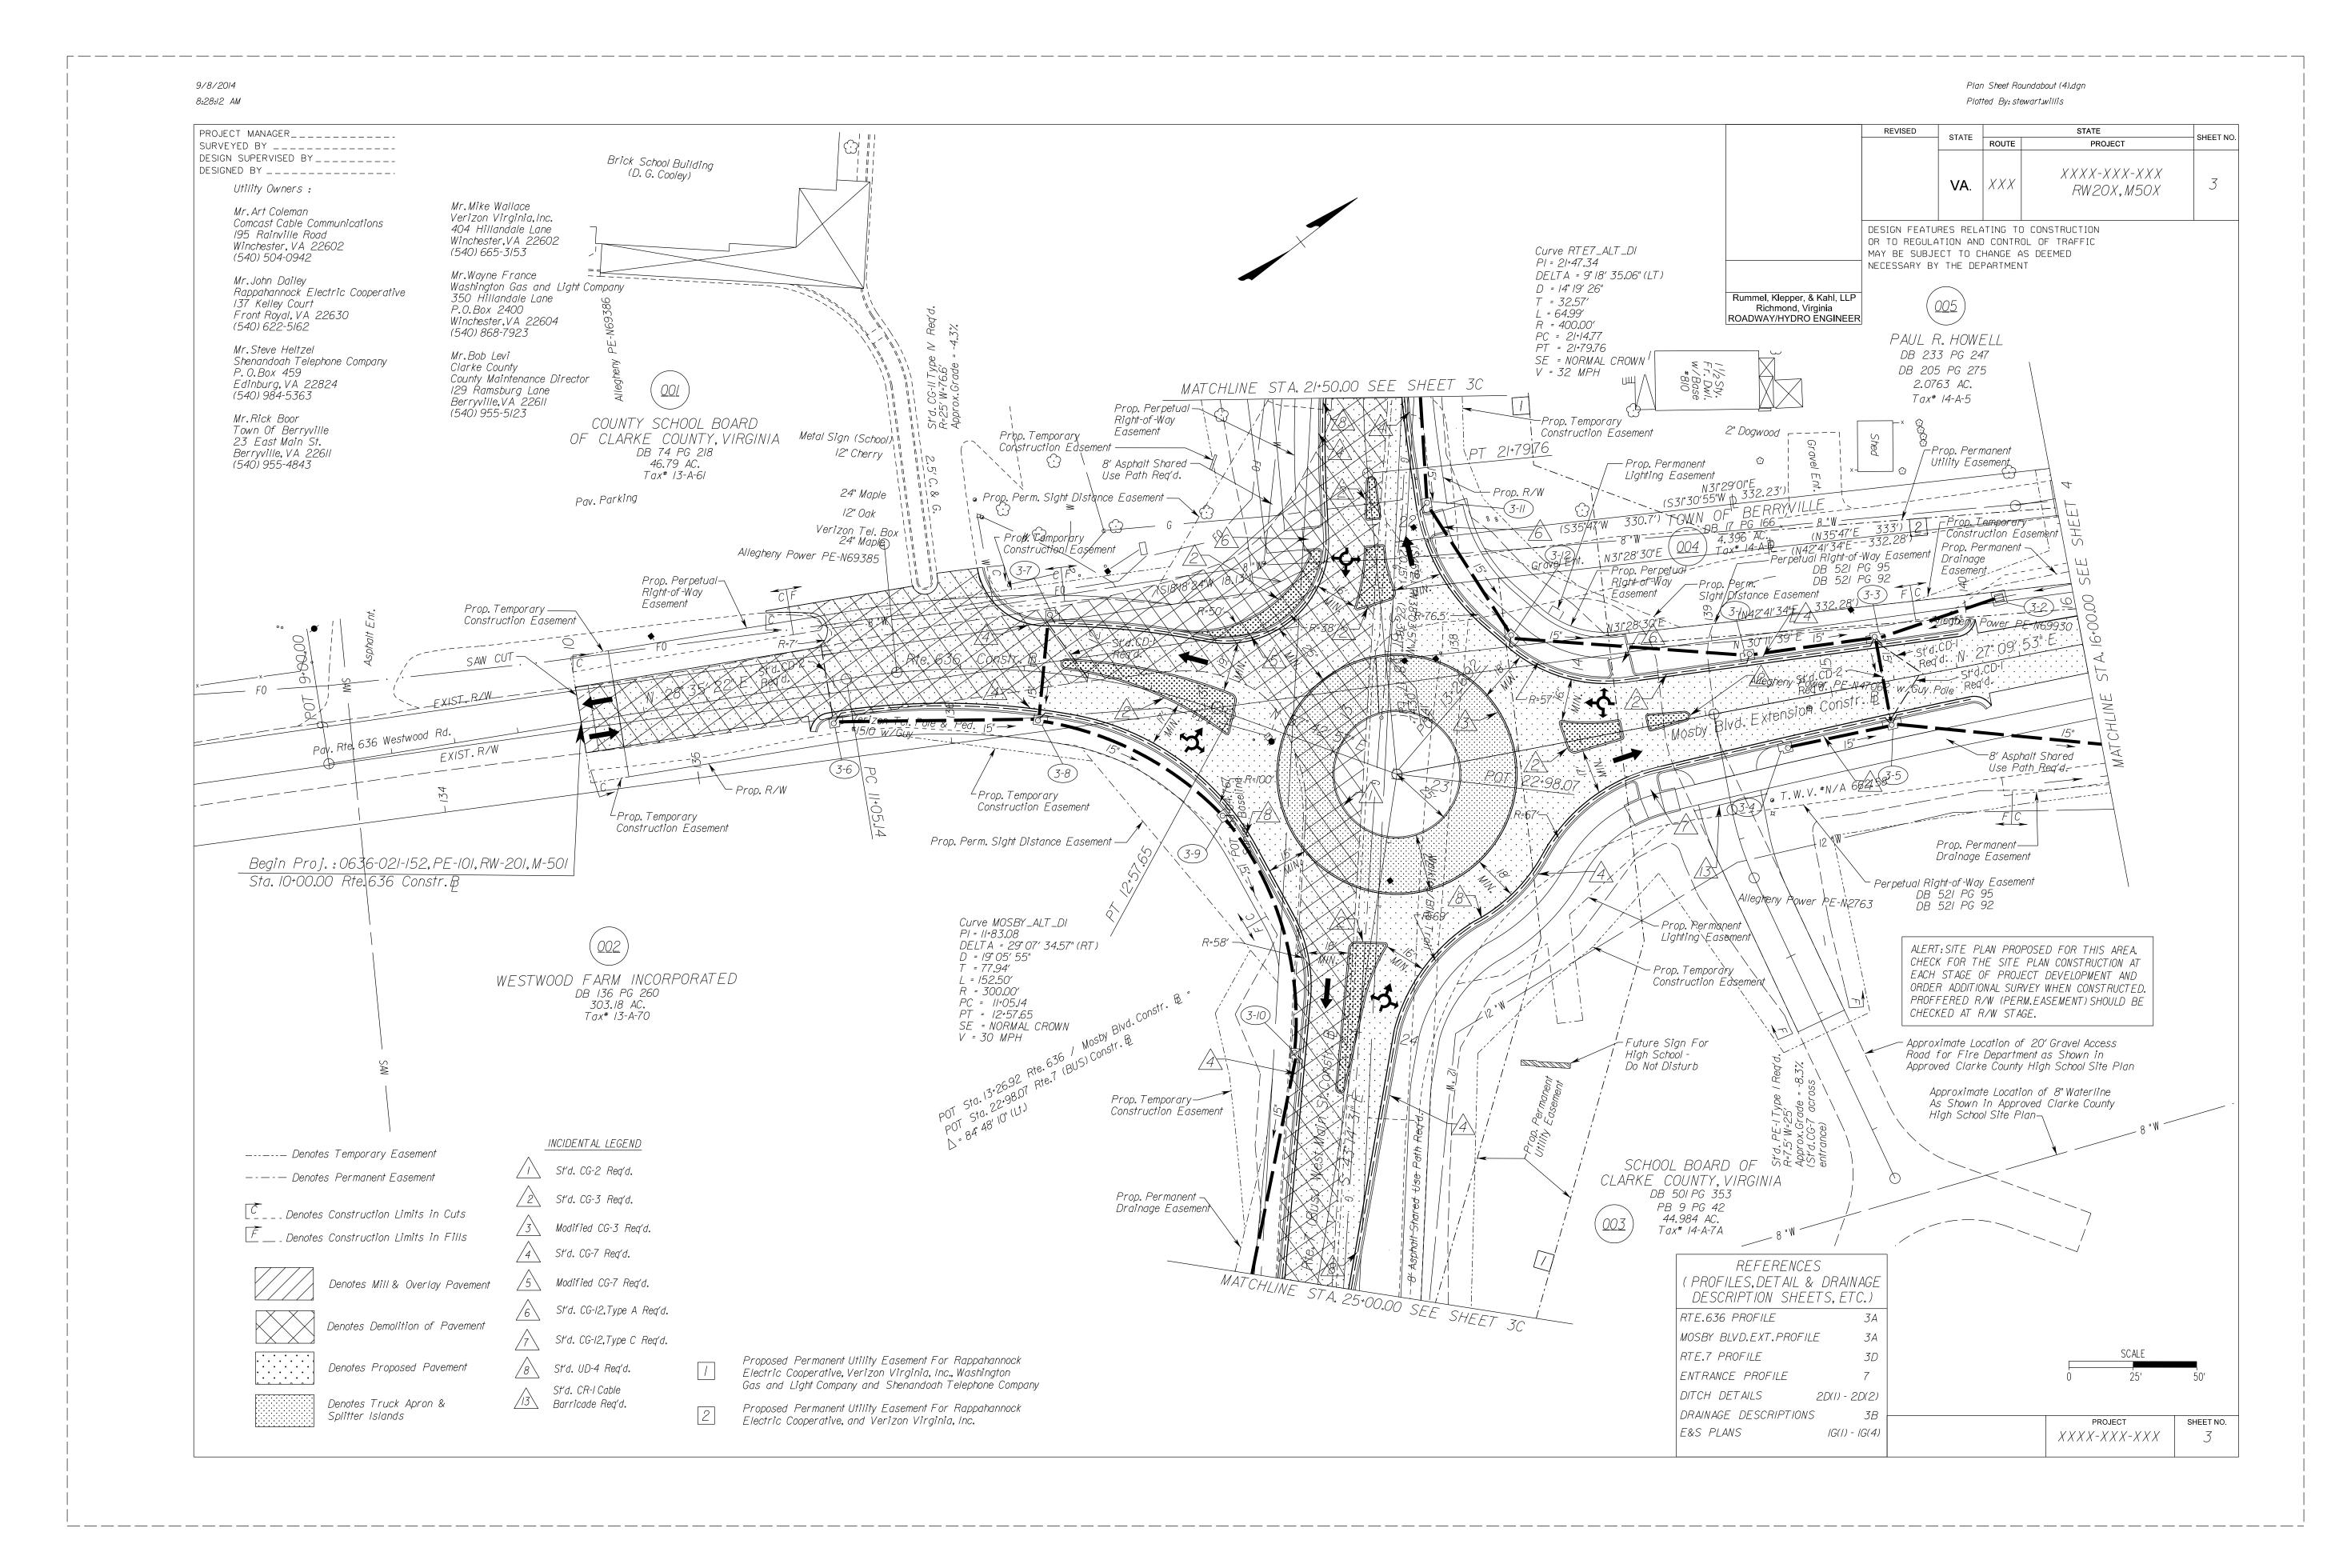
H - 34 SAMPLE 4 PLAN SHEET
